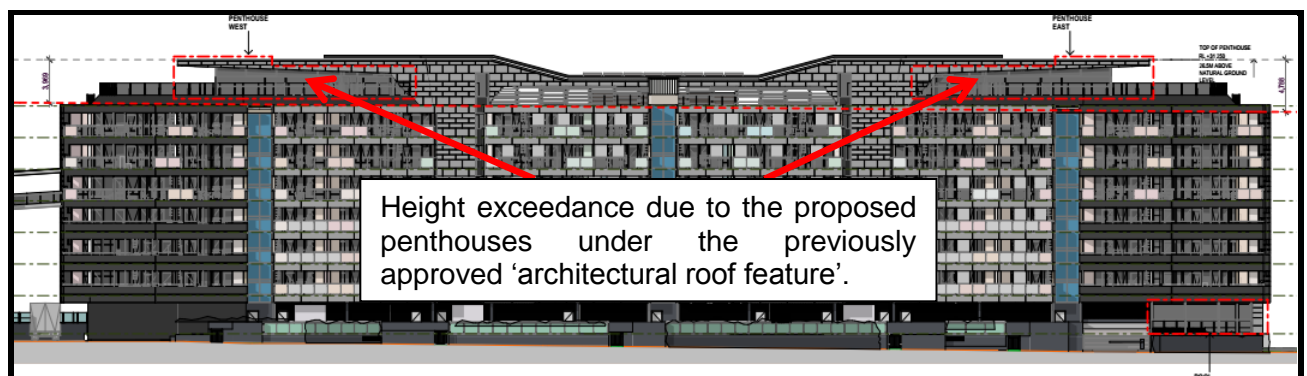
Proposed southern elevation (Source: Clark Keller, dwp Suters, December, 2016)
